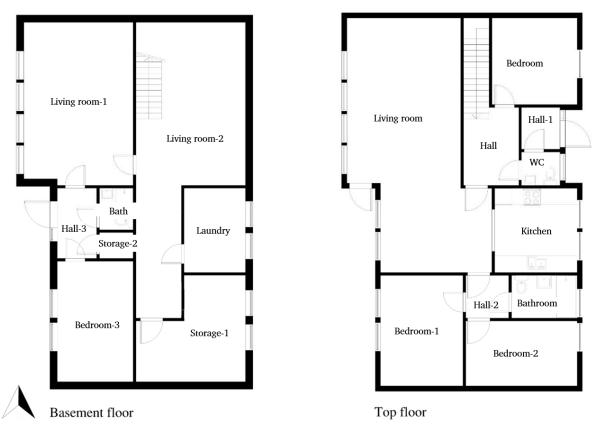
The floor plans of both floors, courtesy of Felius (2021).
